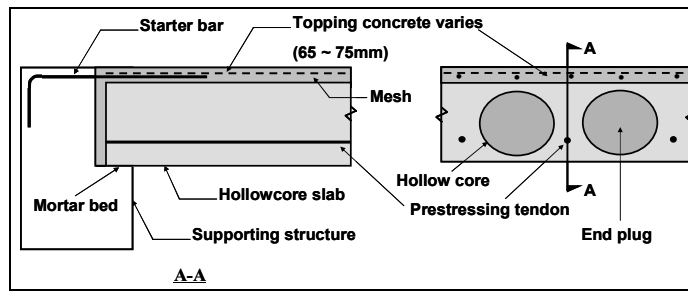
Simple floor-end beam connection detail of hollowcore floors
